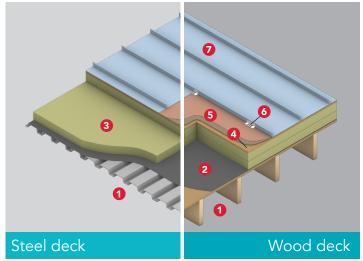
Architectural metal roof panel system supported and attached using an anchoring substrate bearing directly on the insulation, over steel or wood decking
